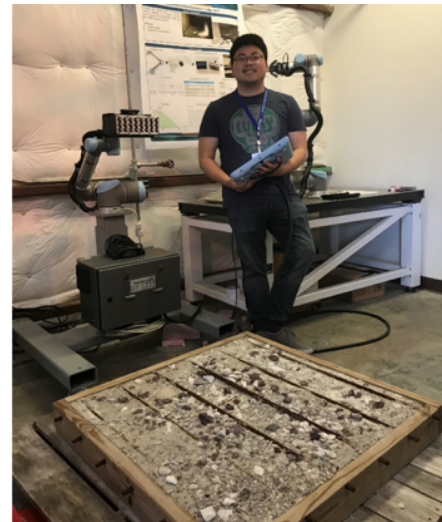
Test Bed deploying concrete inspection instruments on custom designed Concrete Tests forms
